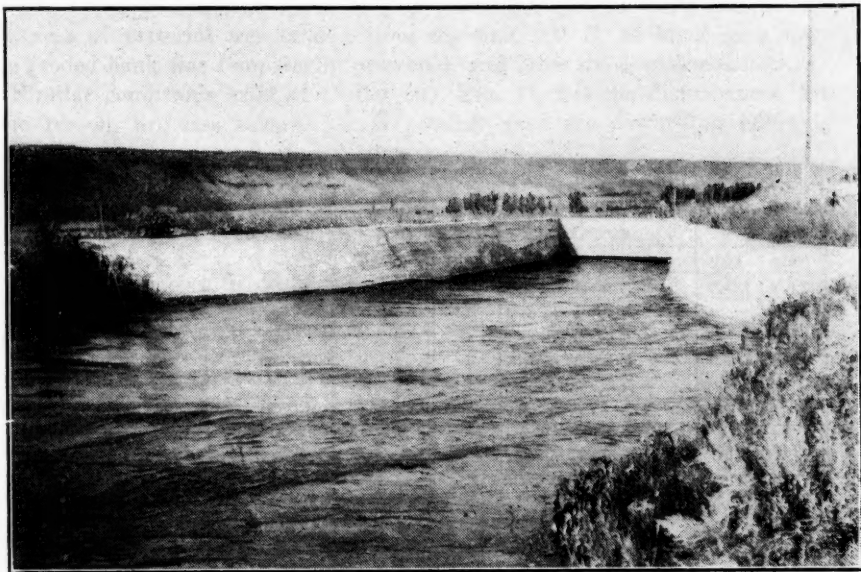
VIEW OF OUTLET, LITTLE PILGRIM SIPHON, KING HILL, PROJECT,
